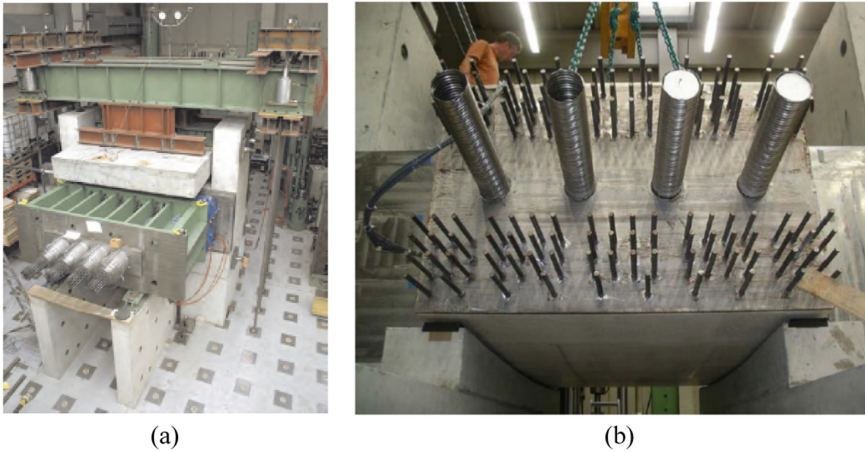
Pictures of PACE mock-up in Karlsruhe Institute of Technology: global view (a), side view before adding the loading device (b)
